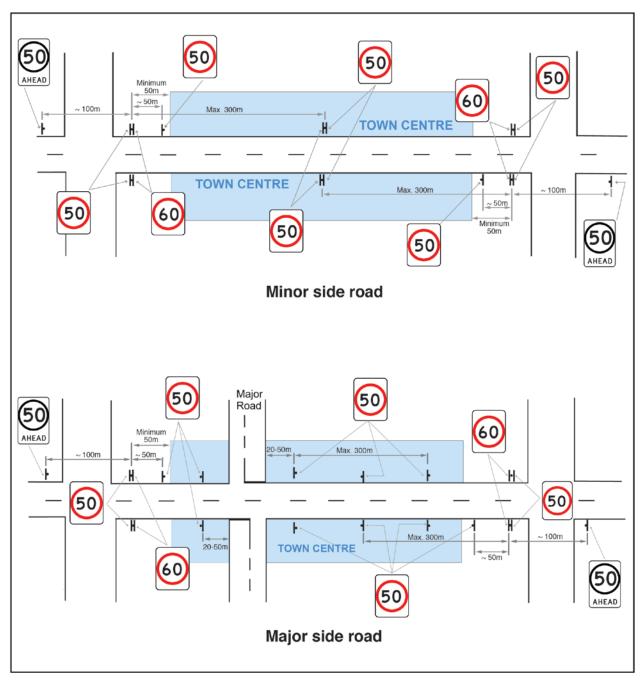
Typical signing layouts for 50 km/h rural and outer metropolitan town centres
